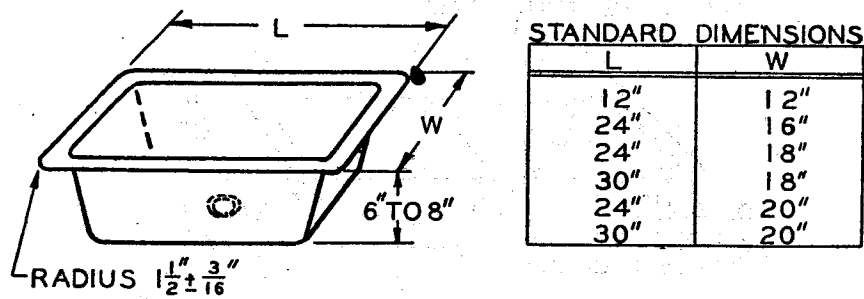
Center-outlet flat-rim kitchen sinks. (Par. 4.4.6.)
